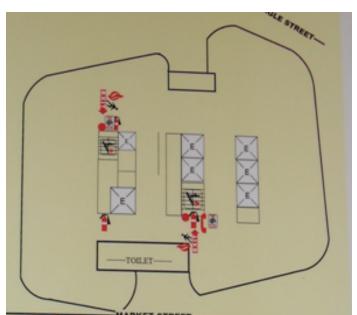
Diagrammatic Floor Plan for Building Three – Exploratory Case Study.
